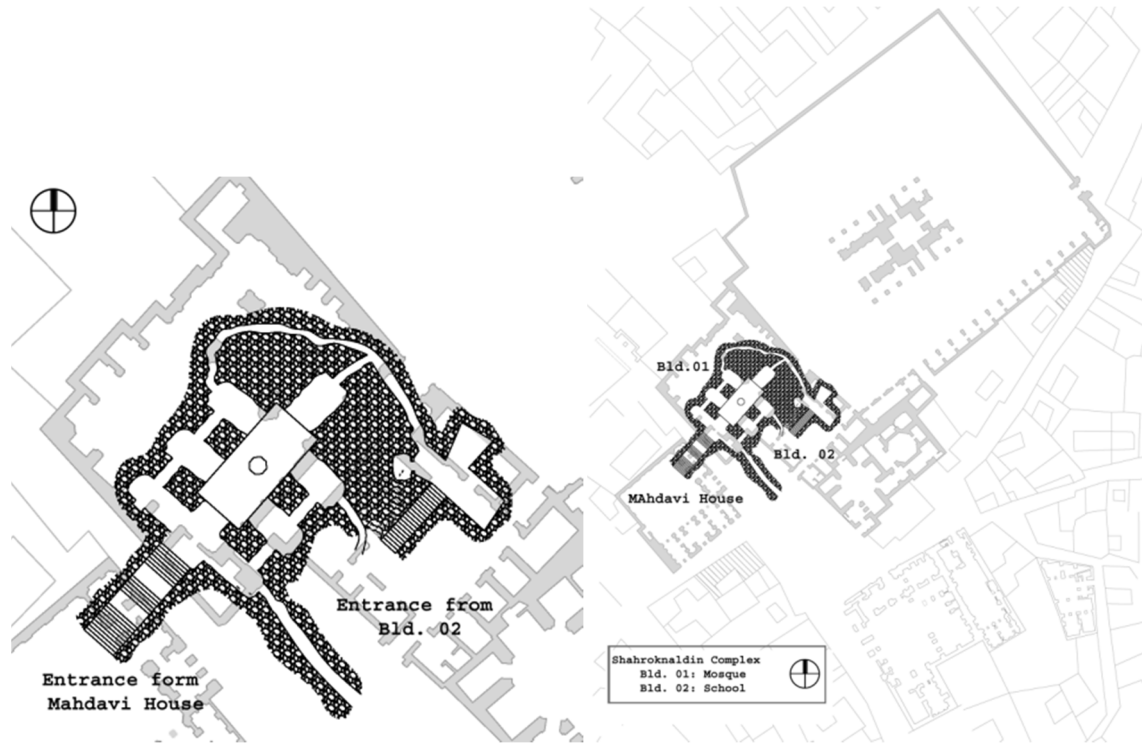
Shah Rokn-al-Din Complex (Bld. 01, 02). Right: Site Plan. Left: Underground Plan (without scale)
